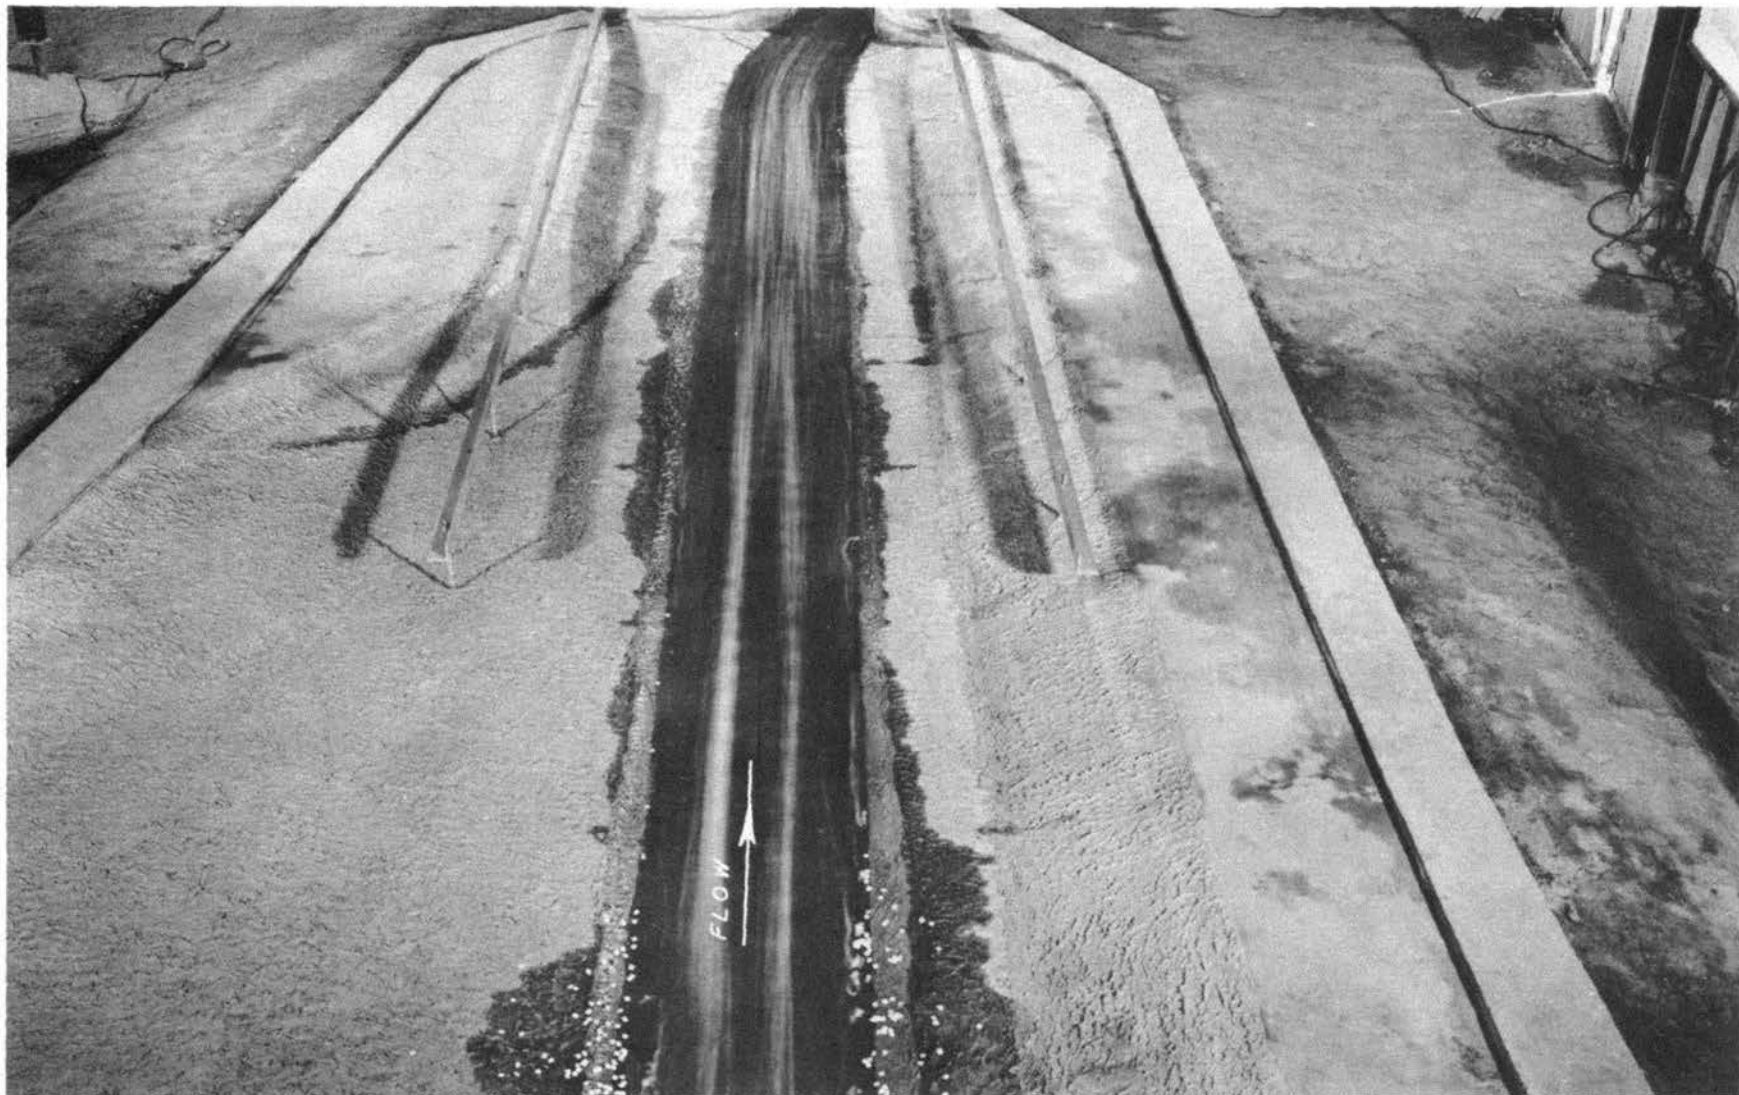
Plan C: flow conditions through paved channel. Discharge, 20,000 cfs; tailwater elevation, 15.4 ft msl. Compare with photograph 7
